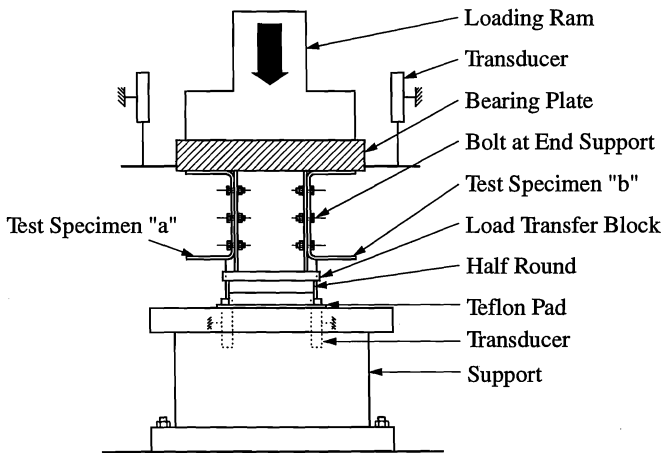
Schematic view of the End-One-Flange (EOF) test arrangement
